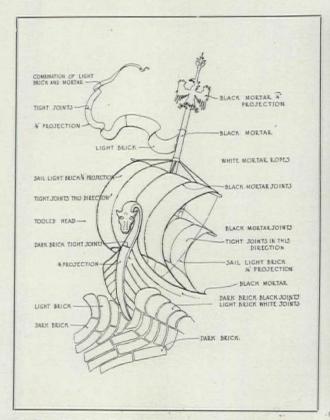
Detail Used by Bricklayer in Executing Ship Design
